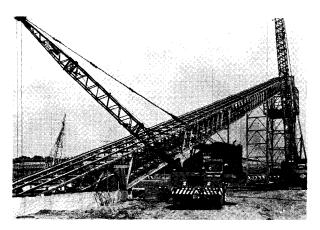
Structural steel erection completed for transfer structure B and inclined conveyor bridge BC-3 and 4, January 14, 1953. Installation of the conveyor tables and rollers is in progress.
